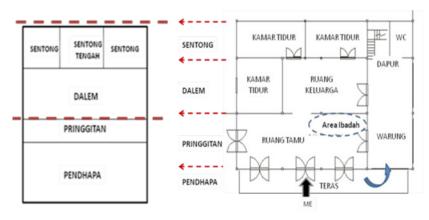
Plan and Spatial Dwelling House of traditional Javanese houses
